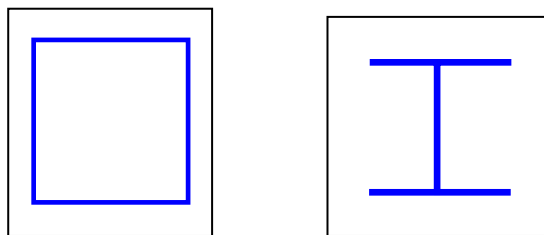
RHS- and H-section protected with a steel sheet casing.
